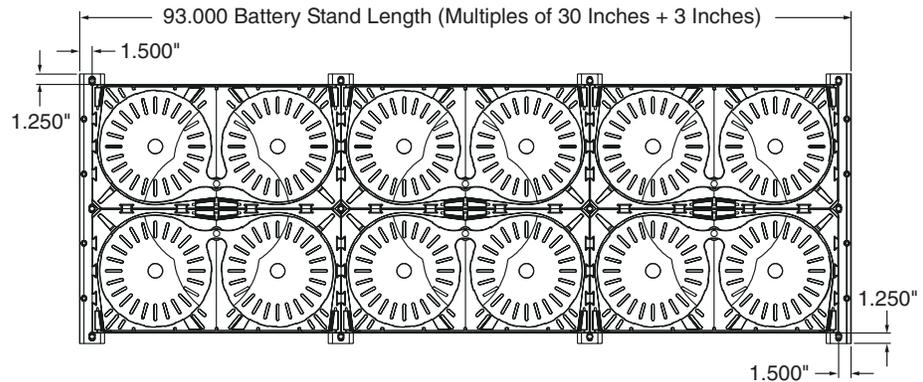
Floor Layout - Zone 2 - Electro-Tyte RC Battery Stand Spill Containment Applications
